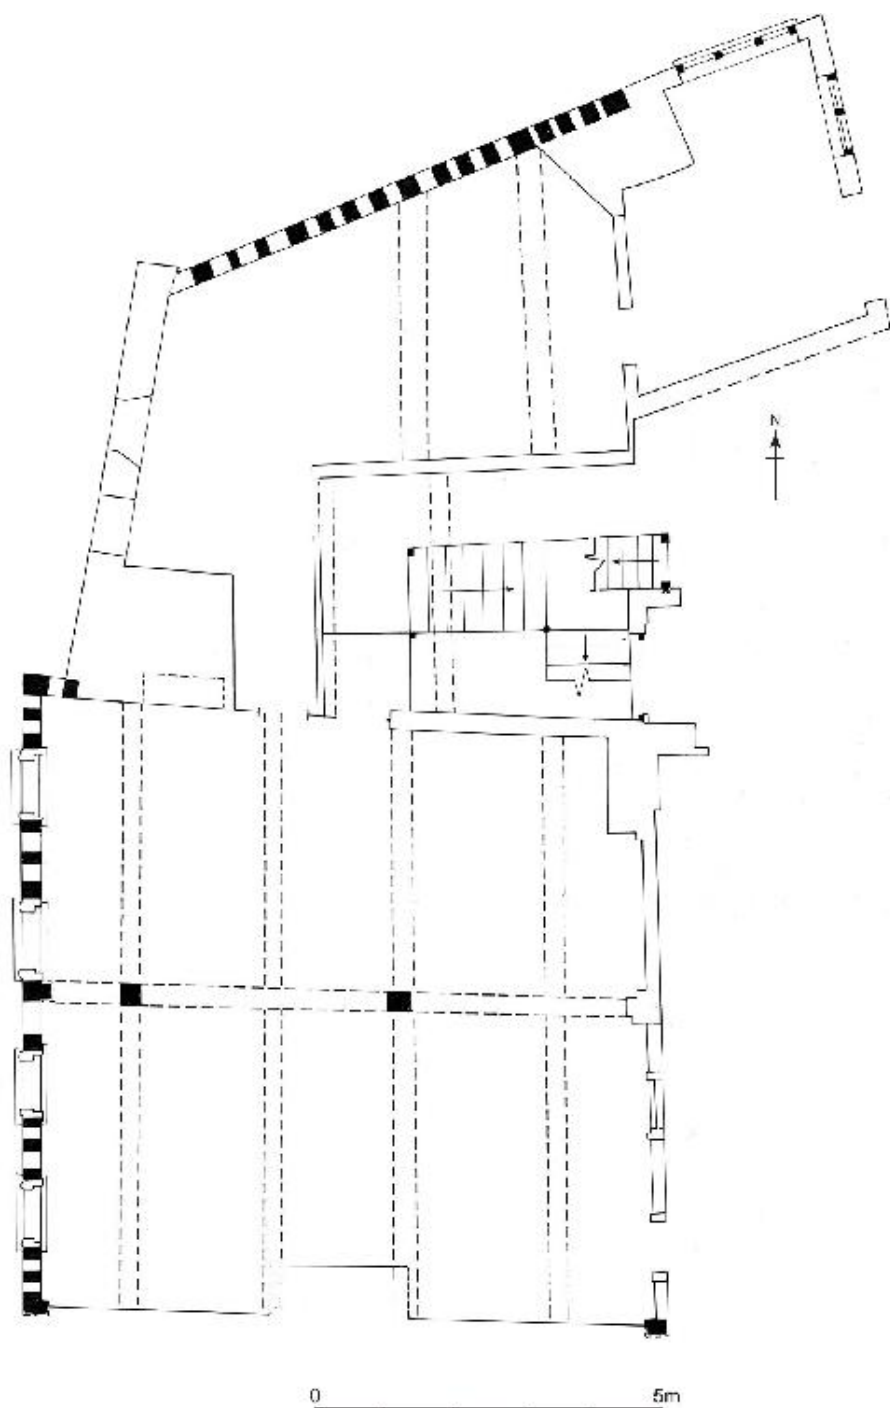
First-floor plan of the former Farmers' Club on Widemarsh Street showing the two basic components: a northern section whose plan is dictated by the position of the former Widemarsh Gate adjoining its west side and the city wall extending north-east; and a virtually square southern section on a 'normal' burgage perpendicular to the street
